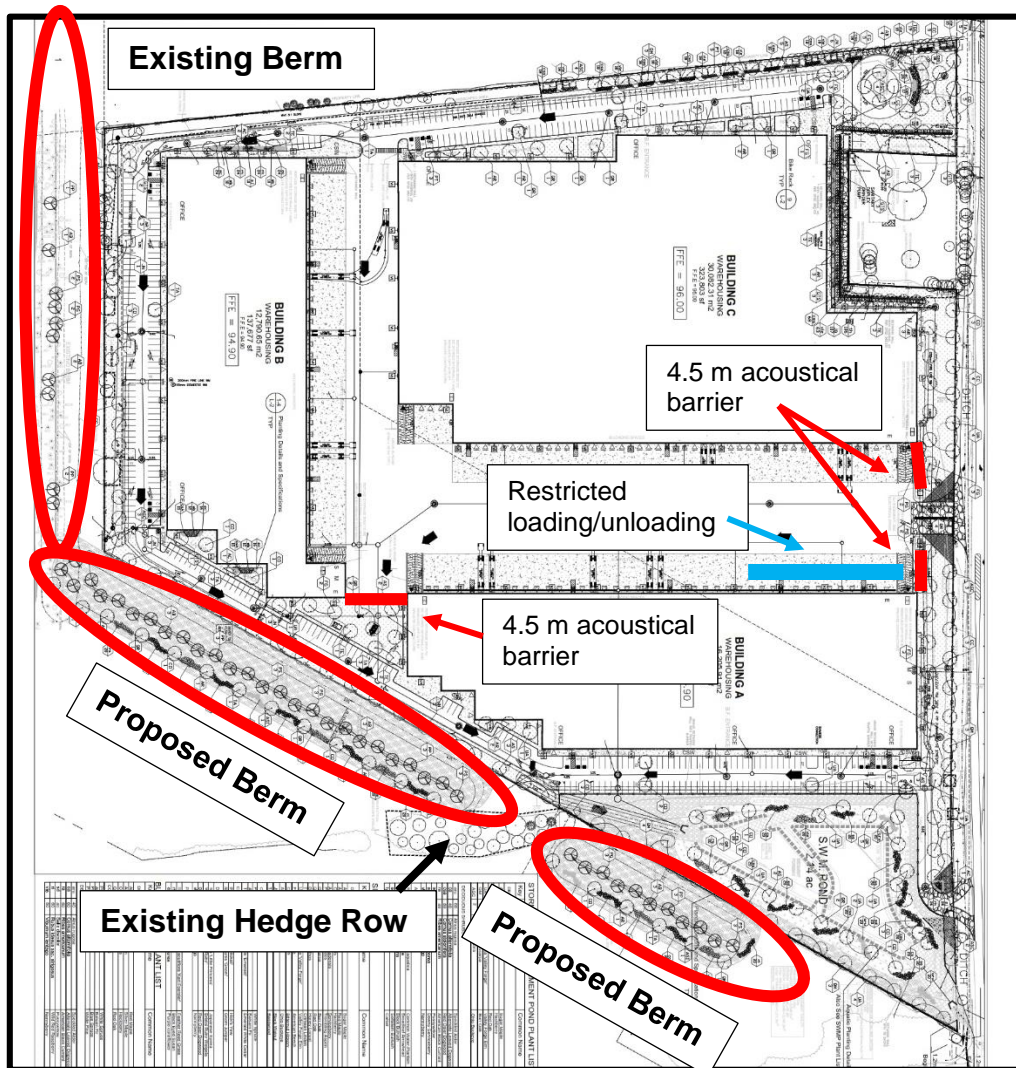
Landscape Plan 560/570/580 Winston Churchill Blvd.
